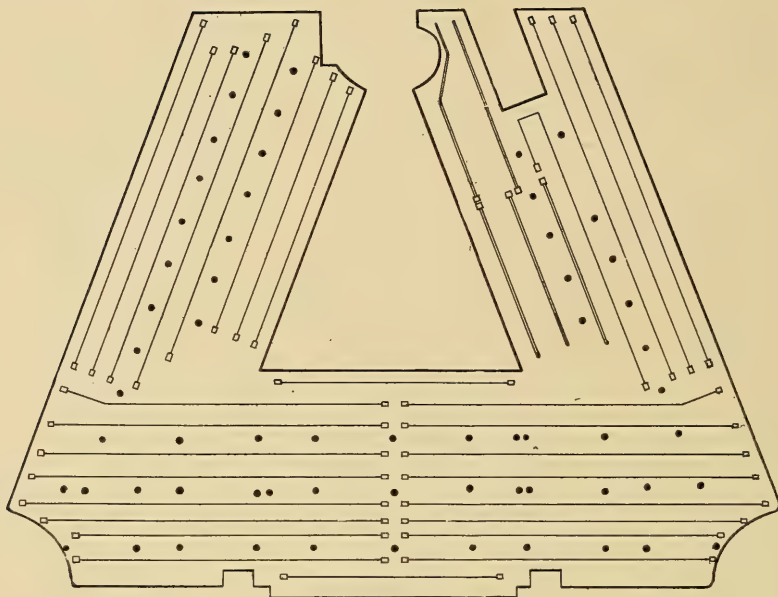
PLAN OF UNITS IN THE NEW YORK POST OFFICE INSTALLATION.
